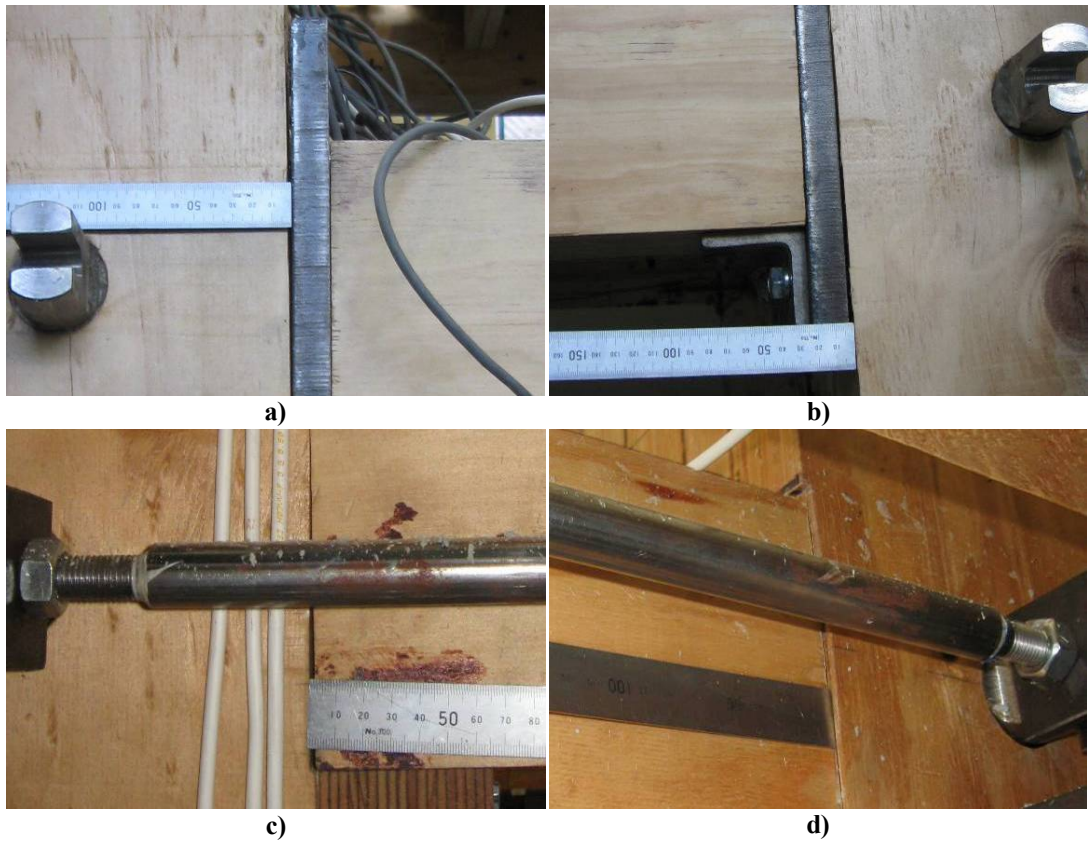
BC connection deformation at negative 2% Drift a) S column, L2 b) SE column, L2 c) S column, L3 d) SW column, L3
